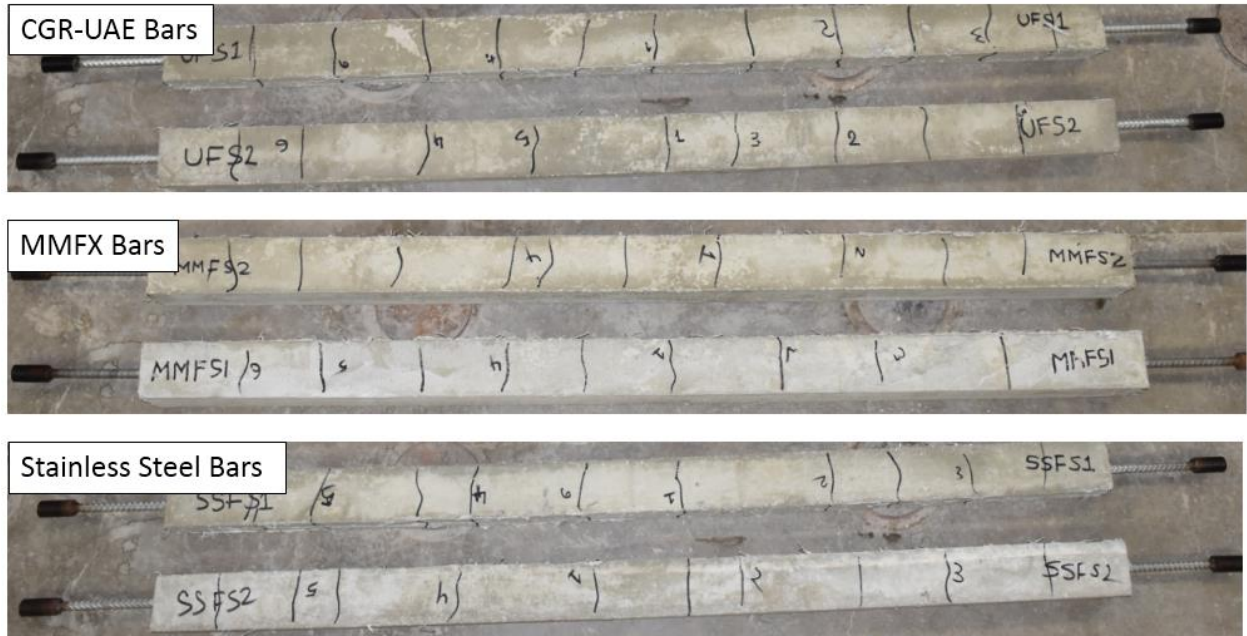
Cracks on Prism Specimens with Fibers with CGR-UAE Bars, MMFX and Stainless-Steel Bars
